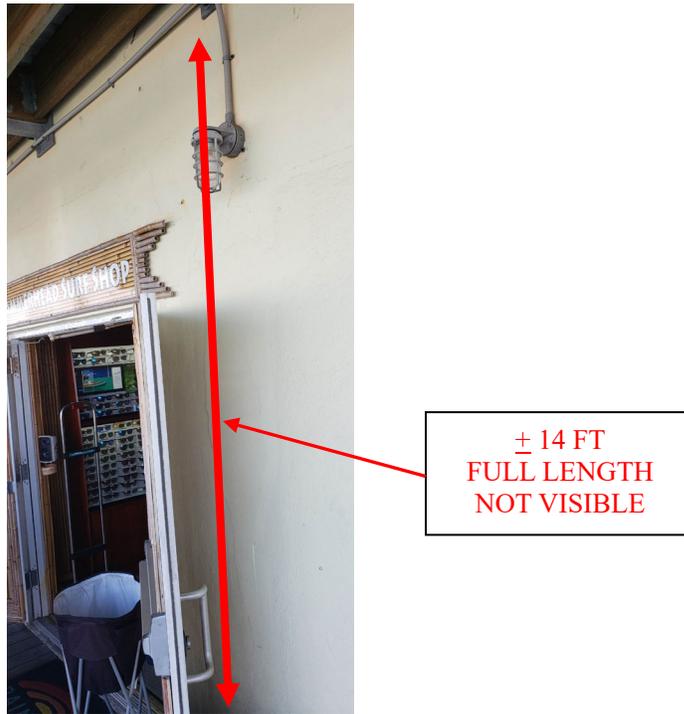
Location 29. Approximately 14 ft long new 16x12 concrete column.
